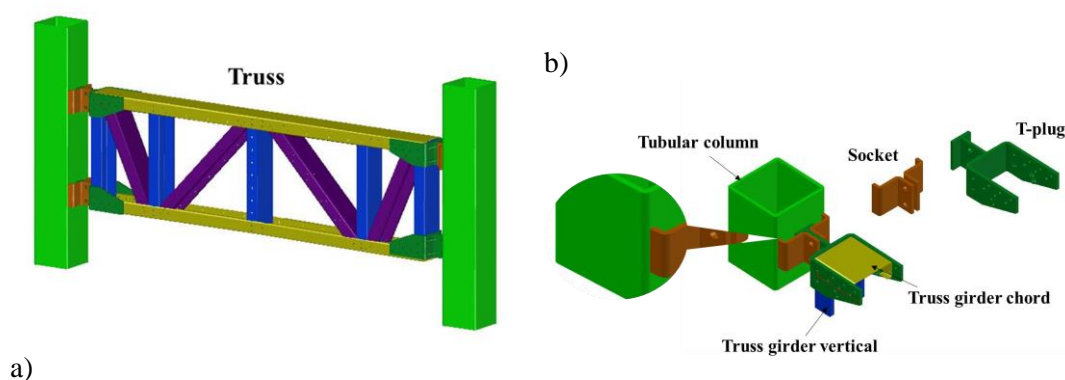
Structural system (a); Details of the plug-and-play connection (b)
